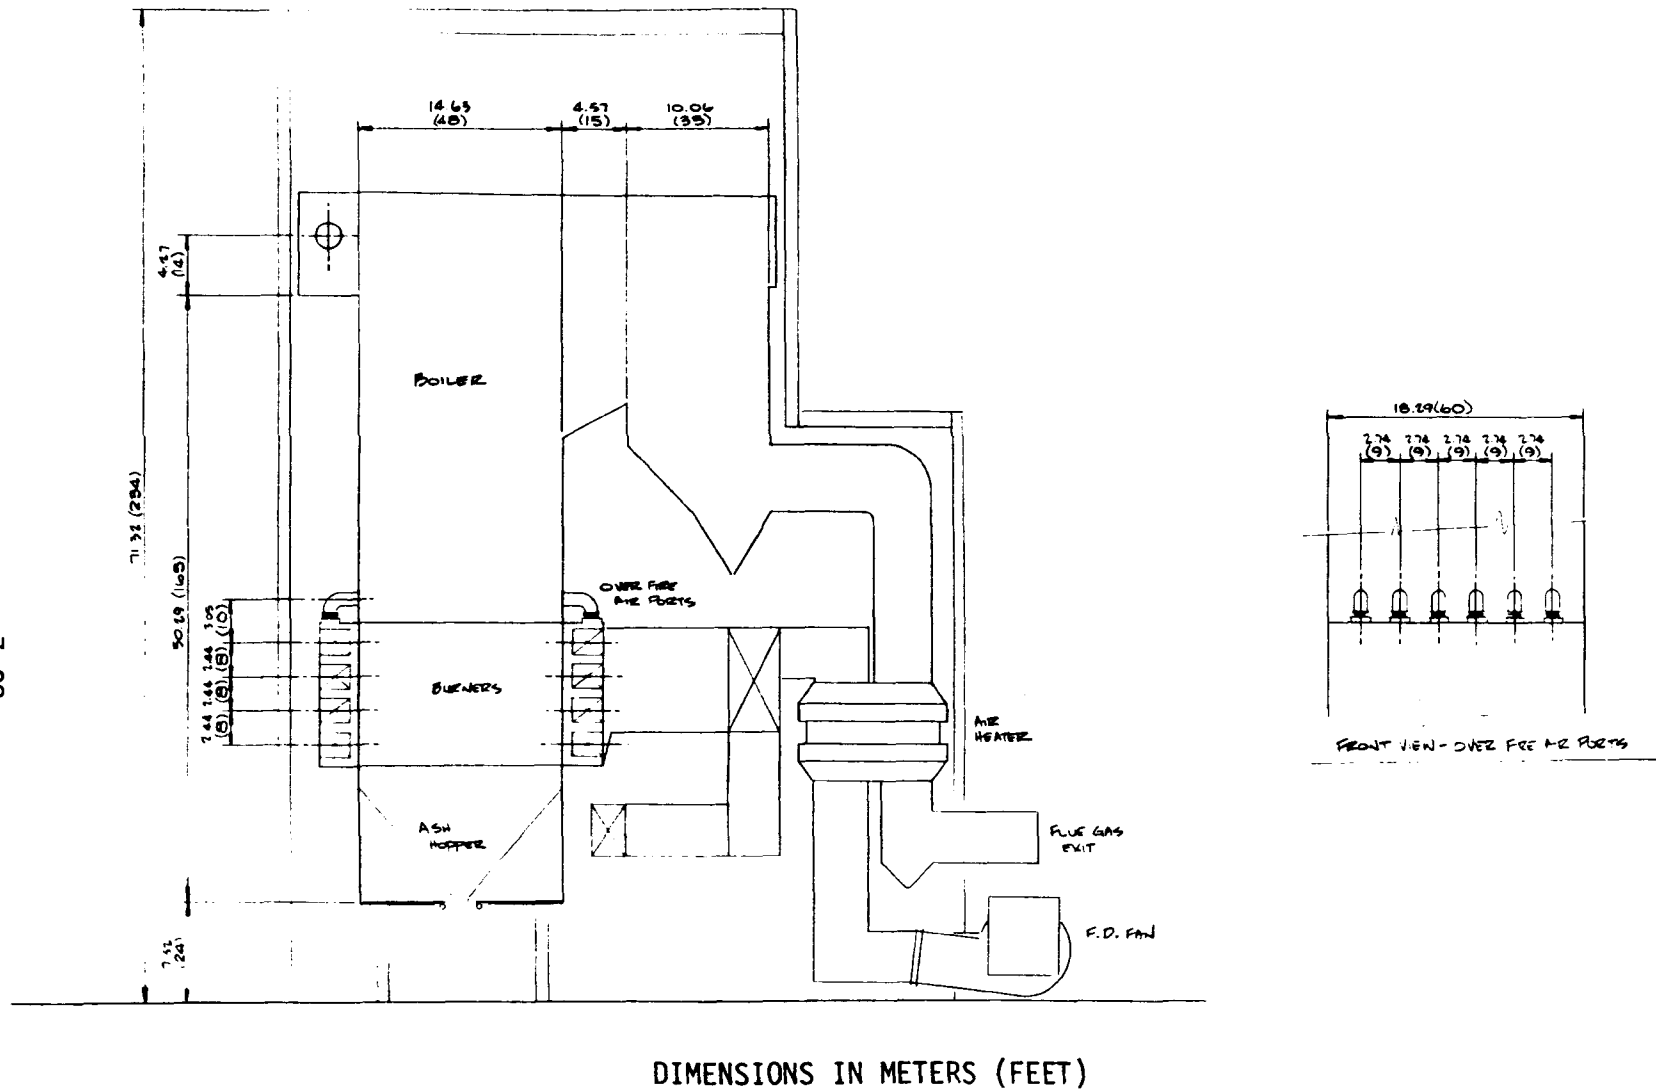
Retrofit overfire air for typical opposed wall coal-fired boilers.
